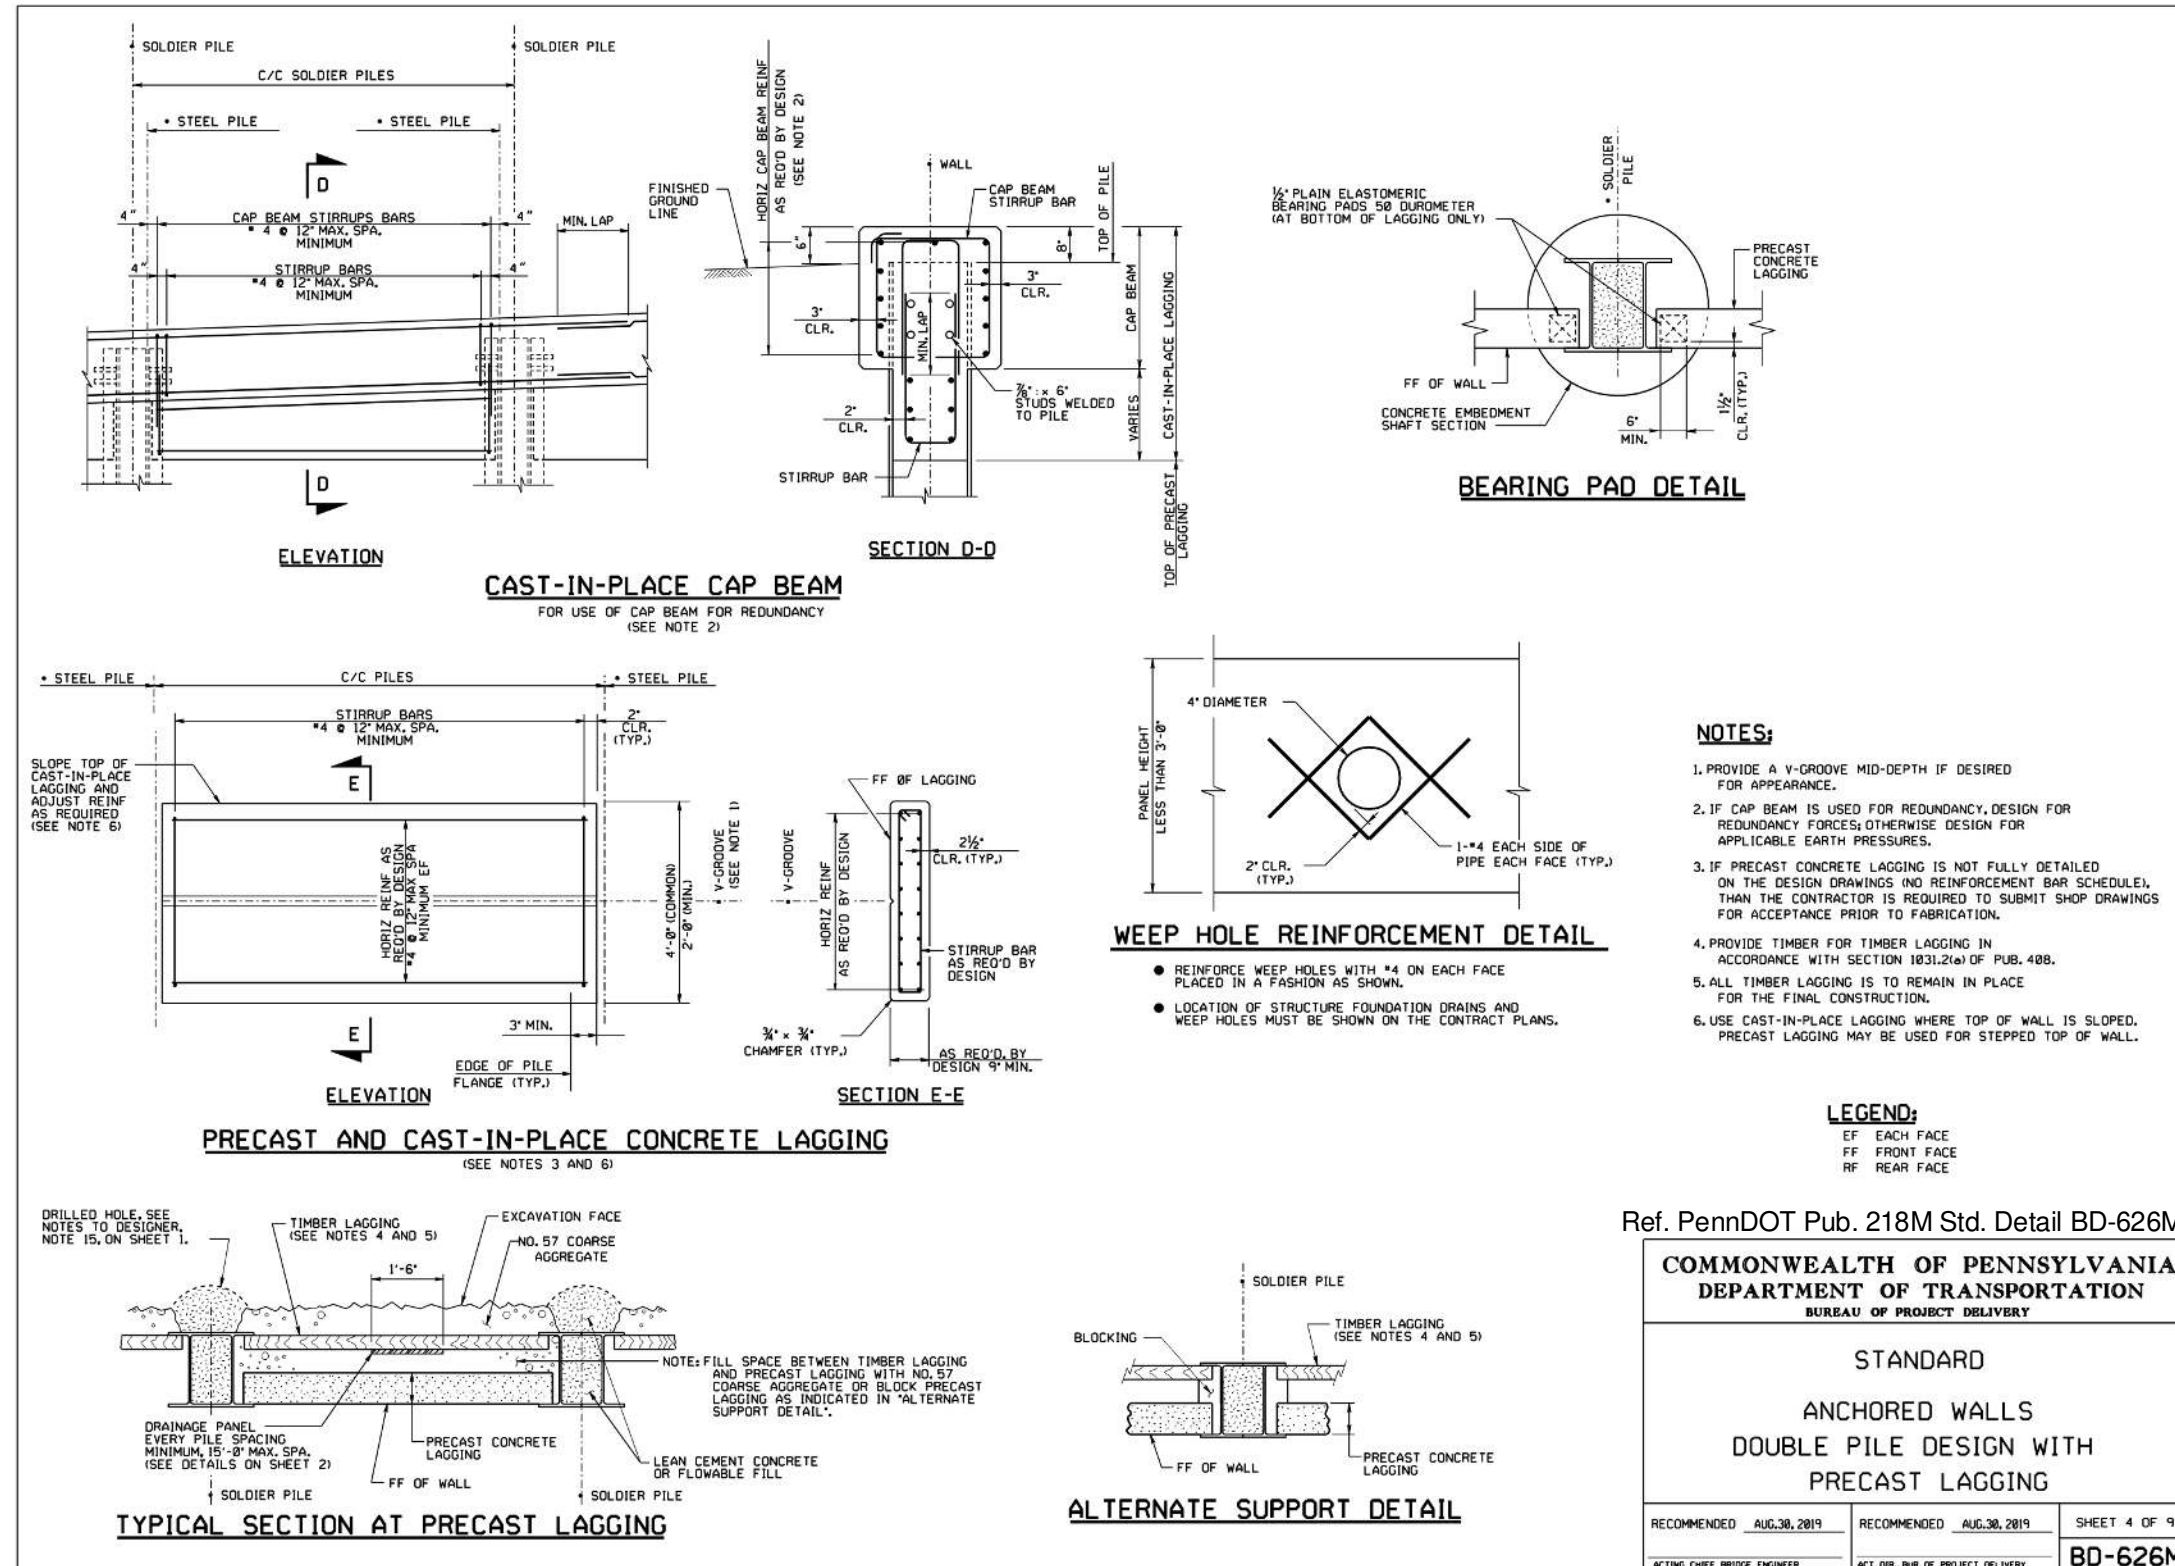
Typical Detail, Anchored Walls (Sheet 4 of 9)
